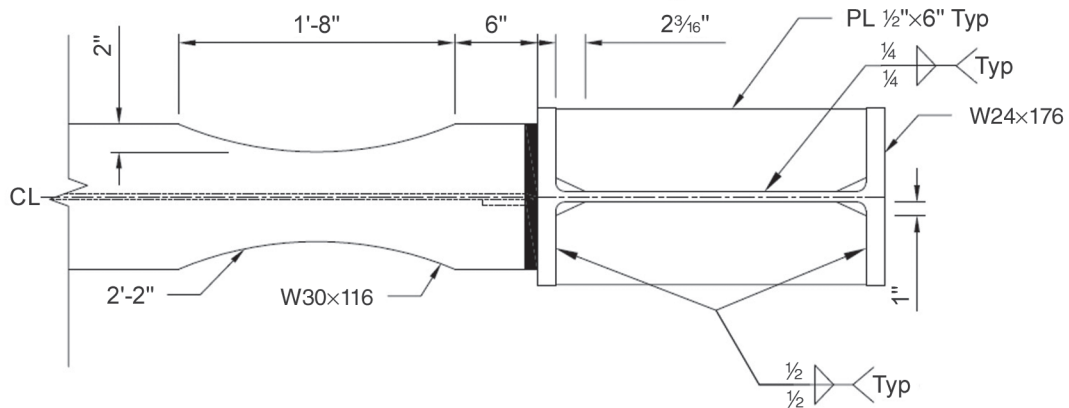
Section through specimen C6 column showing continuity plates and RBS flange cuts.
